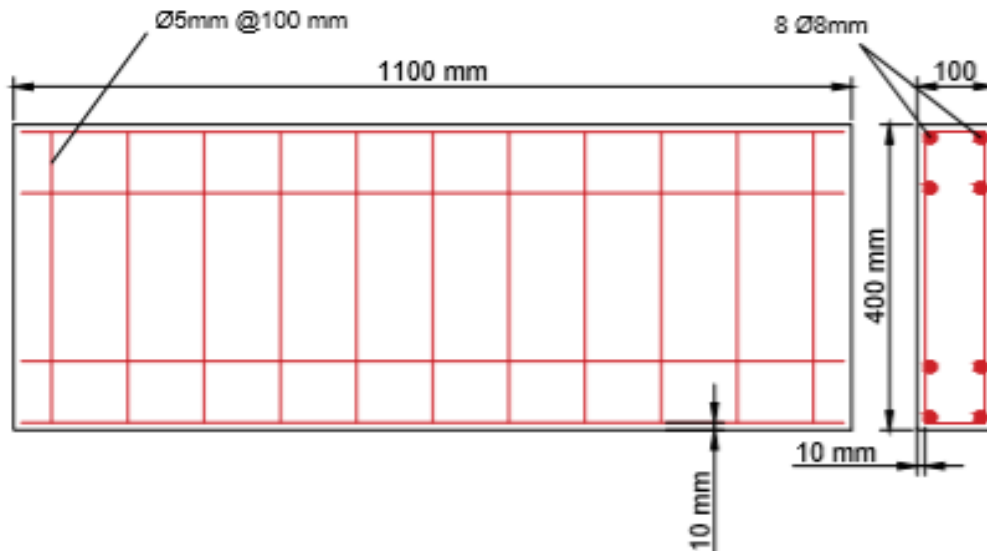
Reinforcement details of reference specimen RN (all dimensions in mm)
